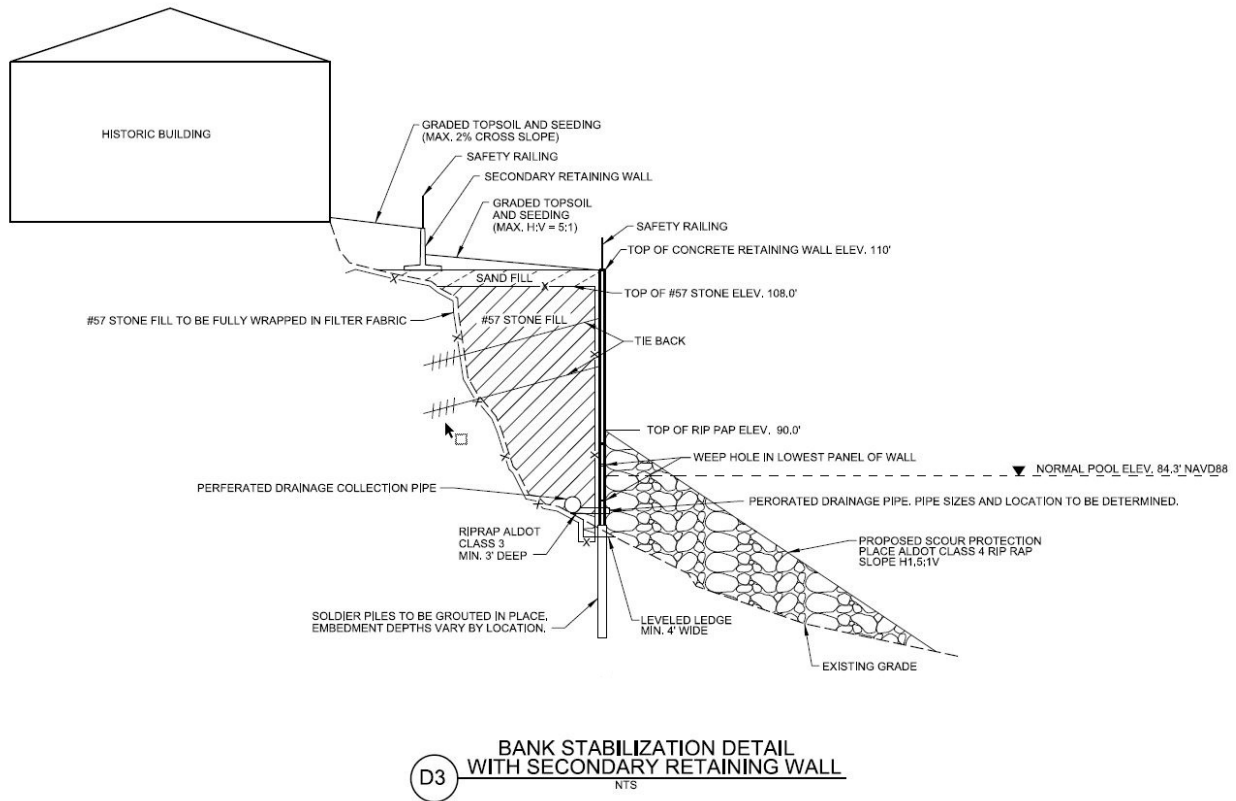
Conceptual Section View for Bank Stabilization in areas where secondary retaining wall is required
